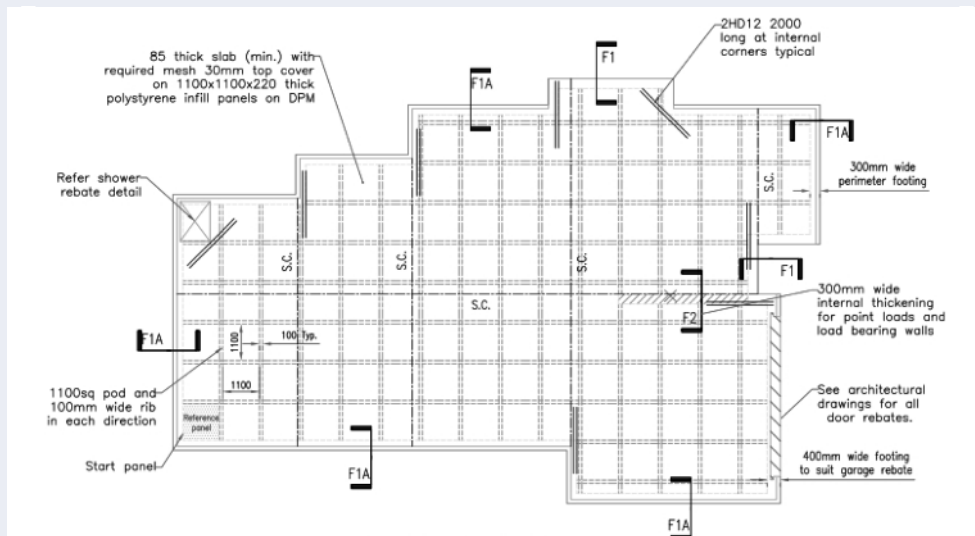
SuperSlab layout (slab area: = 197 m²)
